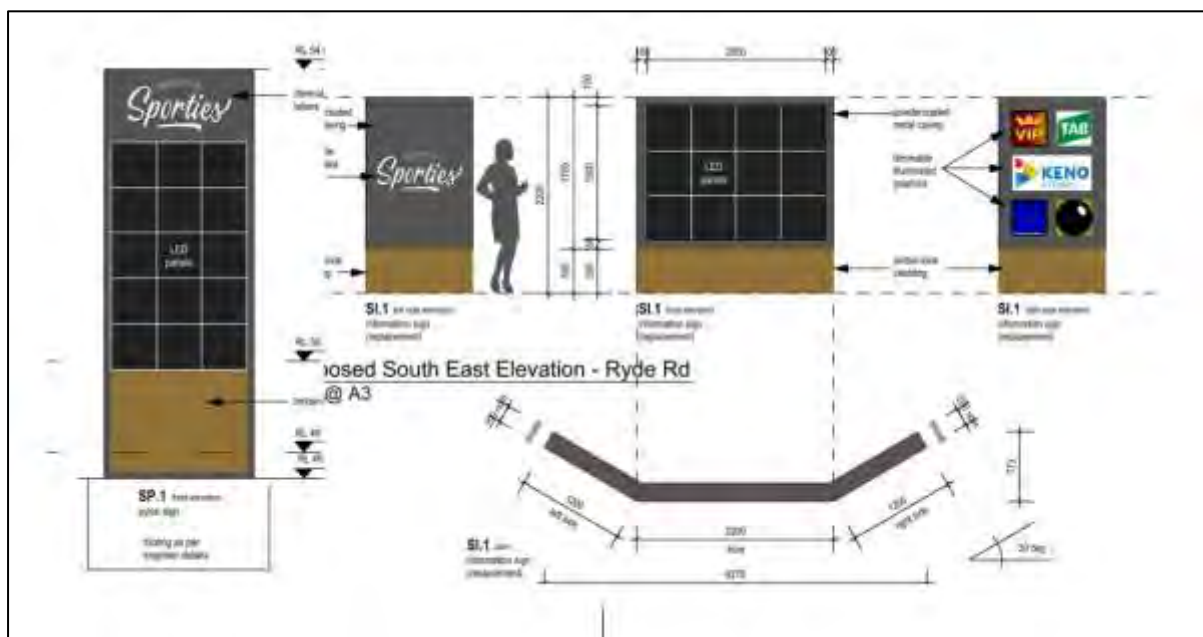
Left: Proposed sign (SP.1) on corner of Ryde Road and Swan Street
